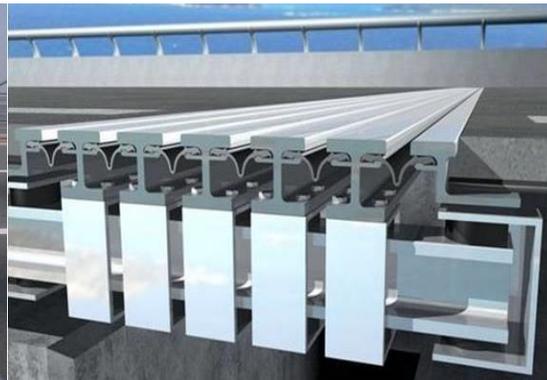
Representation of an installed Tensa-Modular expansion joint (cross section at a support bar), showing stirrup connections to
